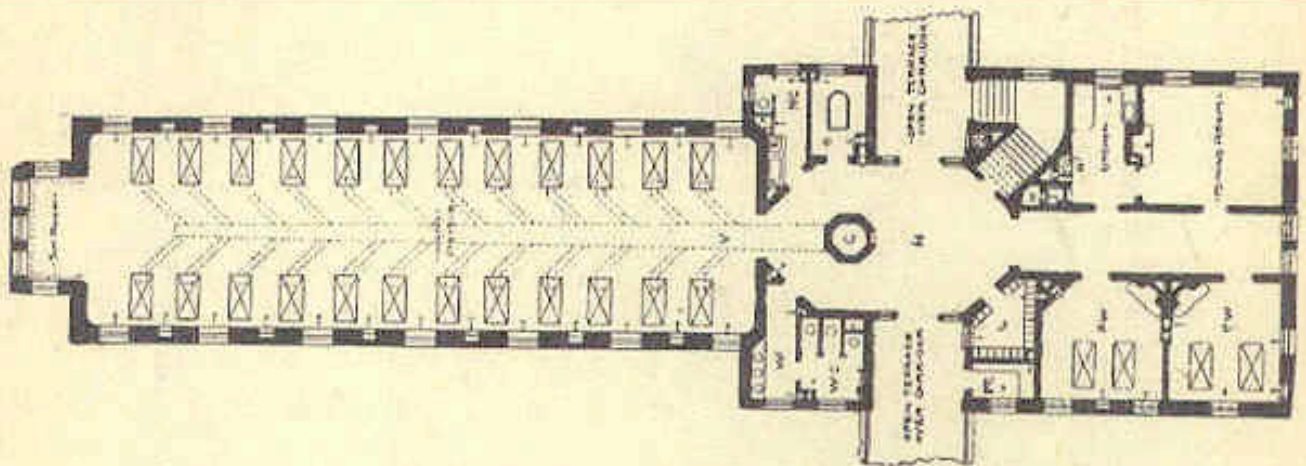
FLOOR PLAN OF COMMON WARD, JOHNS HOPKINS HOSPITAL.
